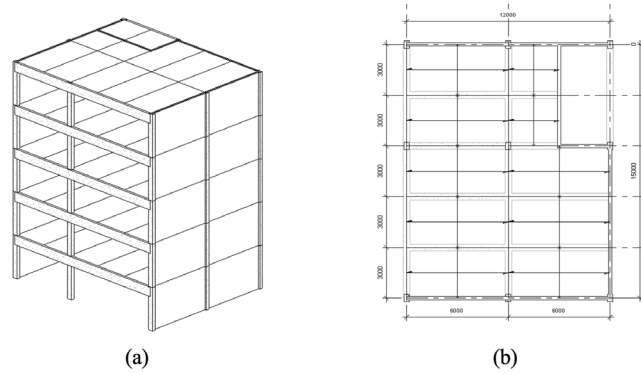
(a) 5-story 3D architectural model and (b) structural layout plan in the illustrative example
